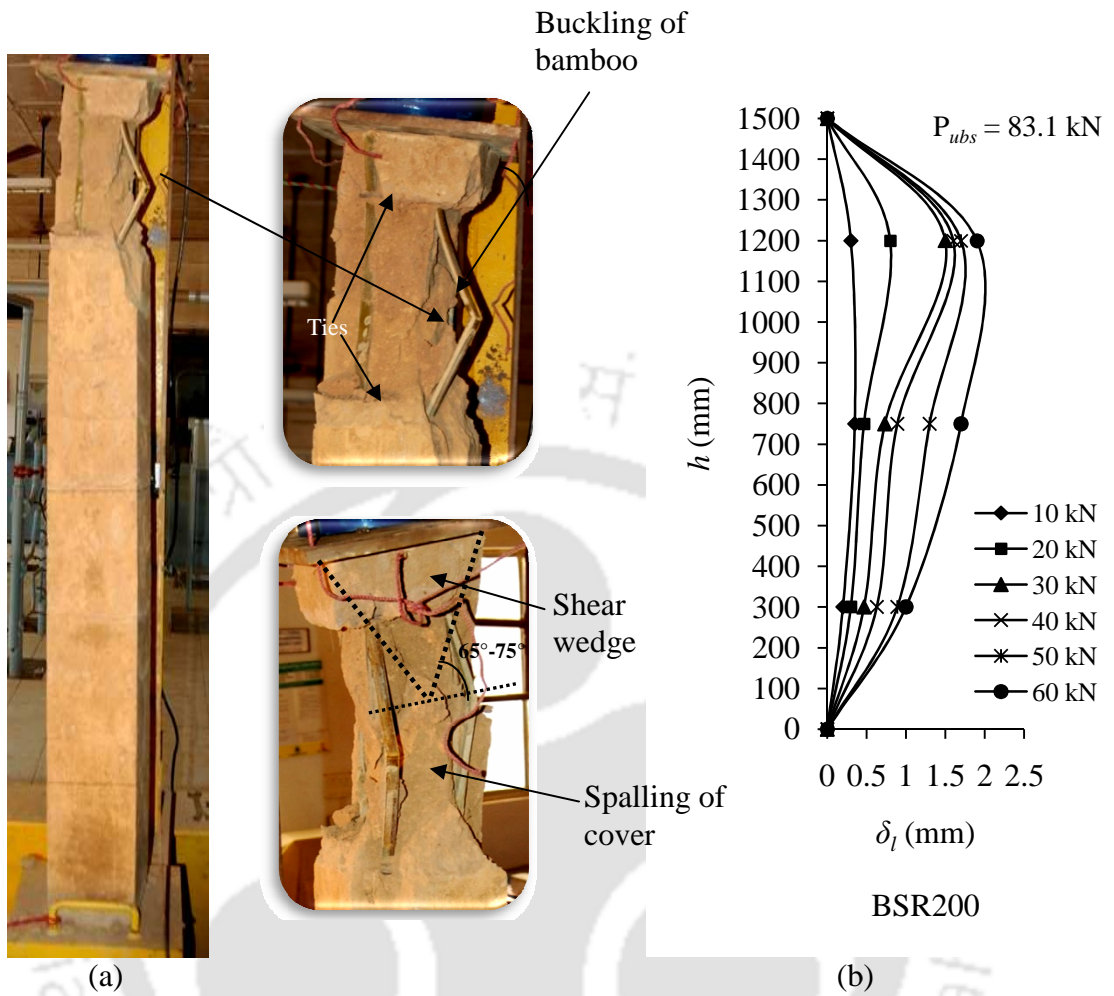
Failure of column with 200 mm tie spacing: (a) failure pattern; and (b) load-lateral deformation curve.
